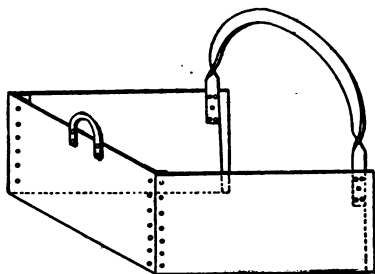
Steel Plate Shield Employed in Laying Sewer Pipe in Quicksand.
